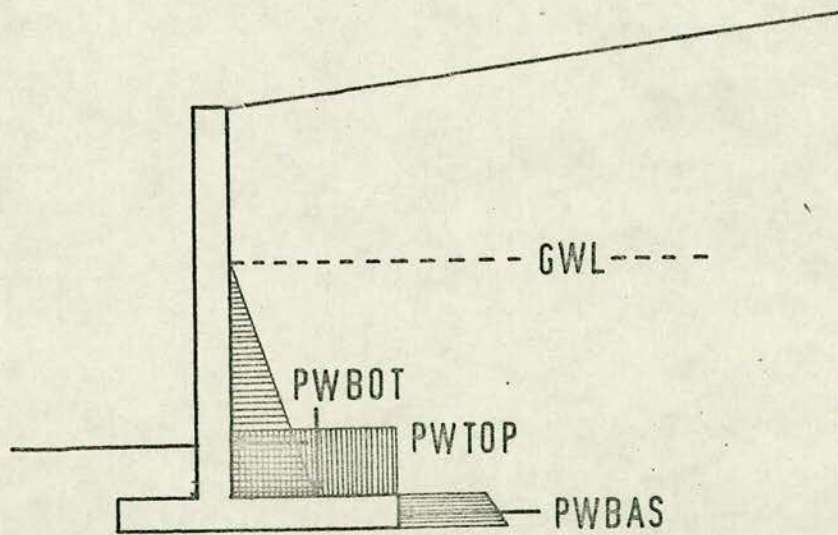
WATER PRESSURE ON CANTILEVER WALL
